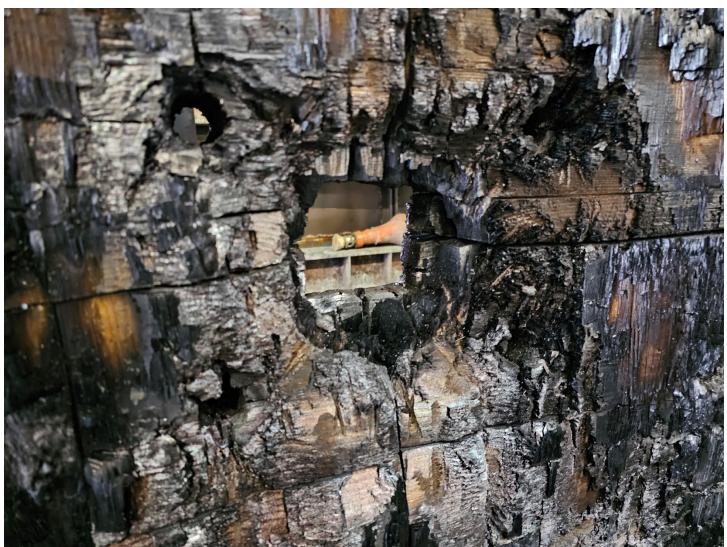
Localized damage through steel column 3 inch x 3 inch steel tube penetration through the CLT assembly.
